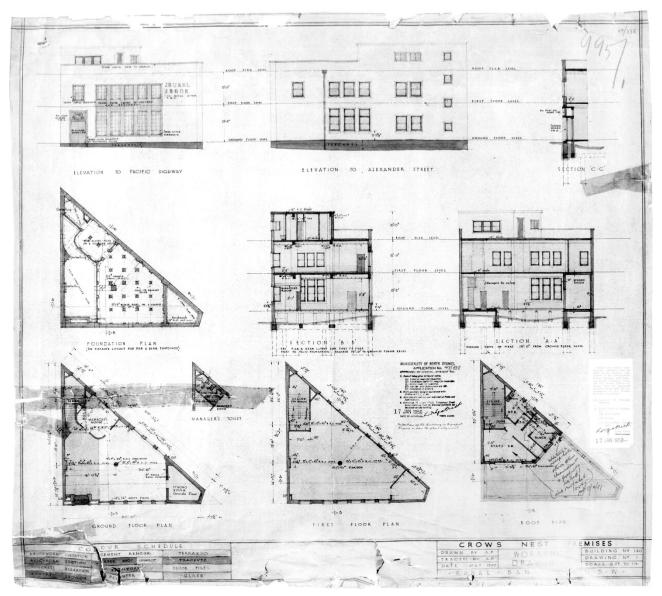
Plans for the Rural Bank Crows Nest Branch, approved 1950. Source: North Sydney Council Buildings Application Archive.
